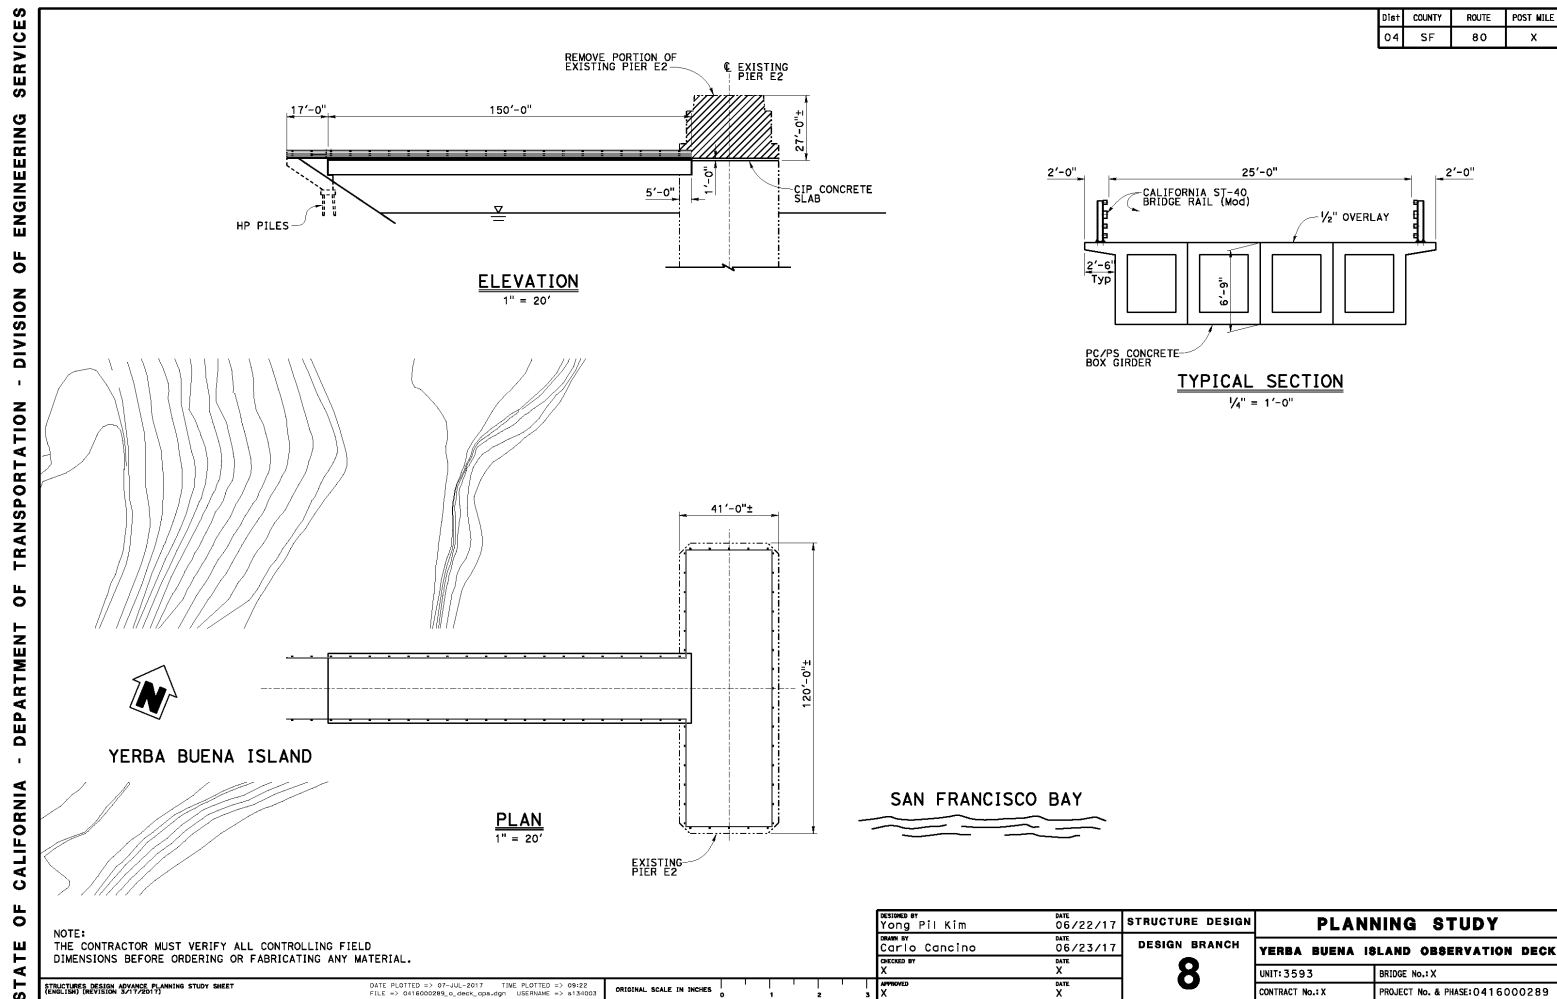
Conceptual Design of Precast Box Girder Bridge Pier (OTD)-Alternative 1
